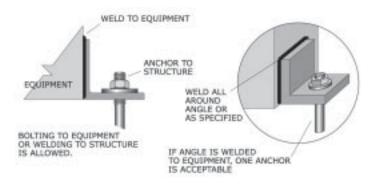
Four or more angles welded to equipment and bolted to the floor/pad.
